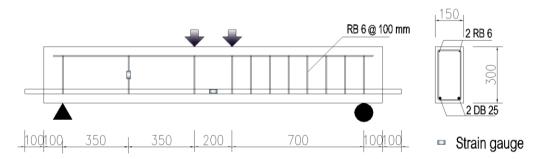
Geometry and reinforcement of RC beams (unit: mm)
